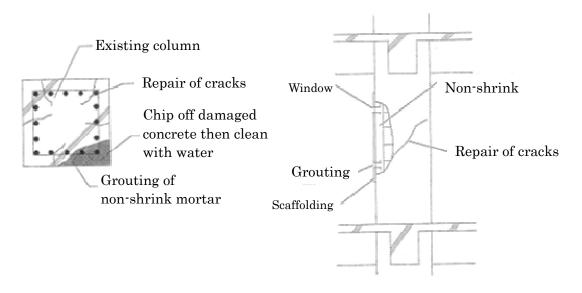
Restoration of Column Rebars (filling of cracks)
